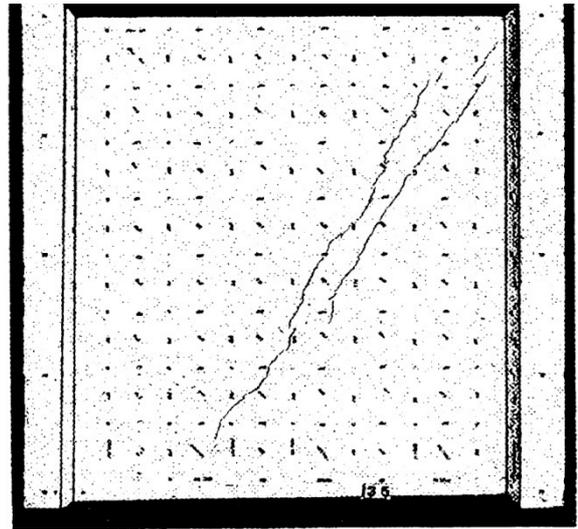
Initial shear cracks on wall S2 tested by Maier and Thürlimann (1985)
